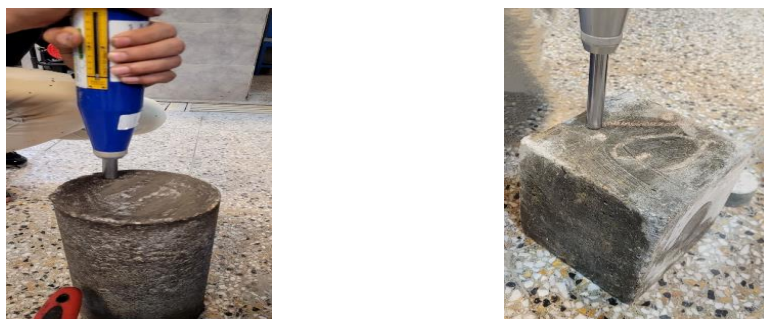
Hardness Testing on Cubic and Cylindrical Specimens
